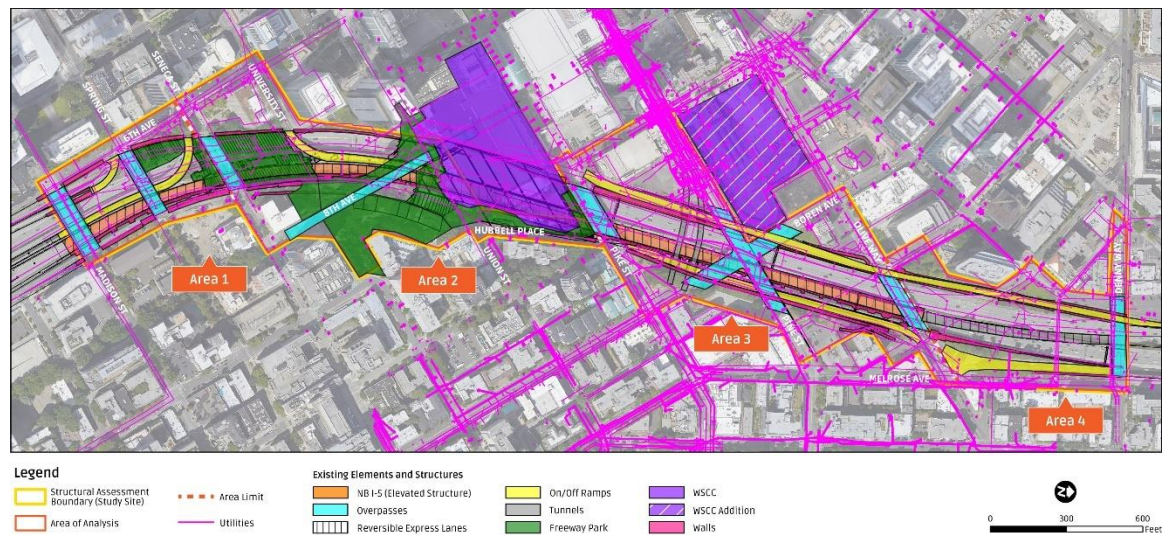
Noteworthy Existing Elements and Structures within the Structural Assessment Boundary
